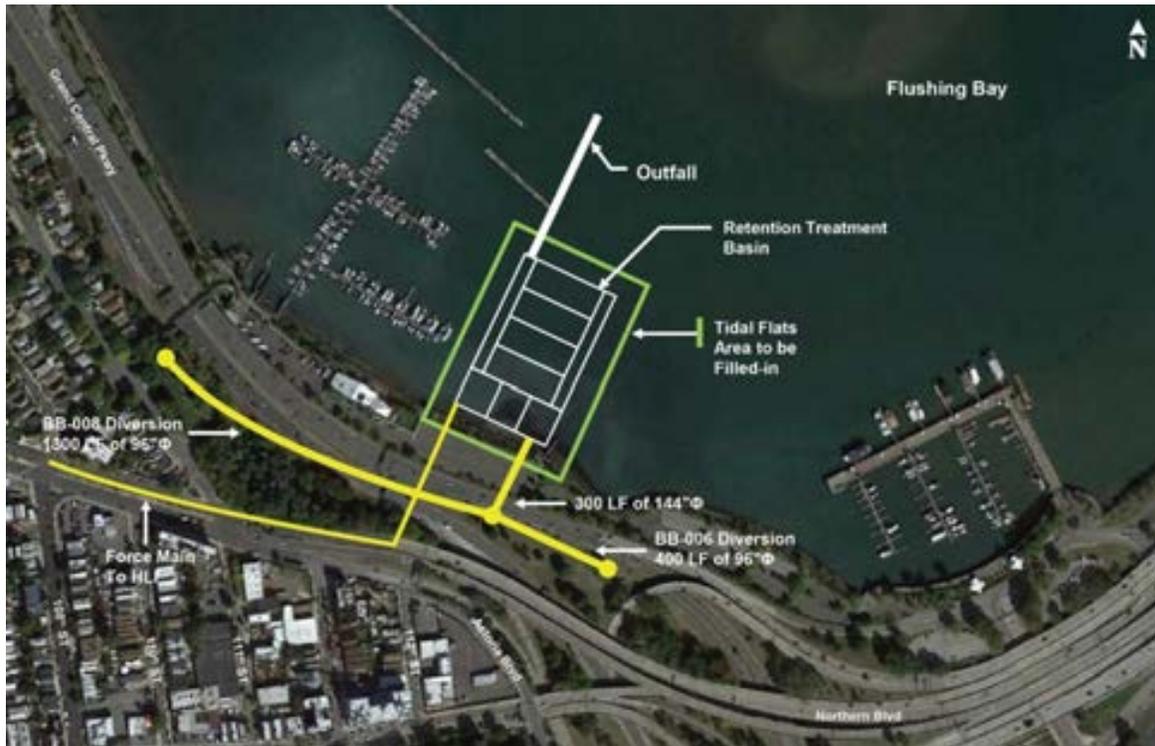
Layout of Alternative 9-5 – In-water Retention Treatment Basin
